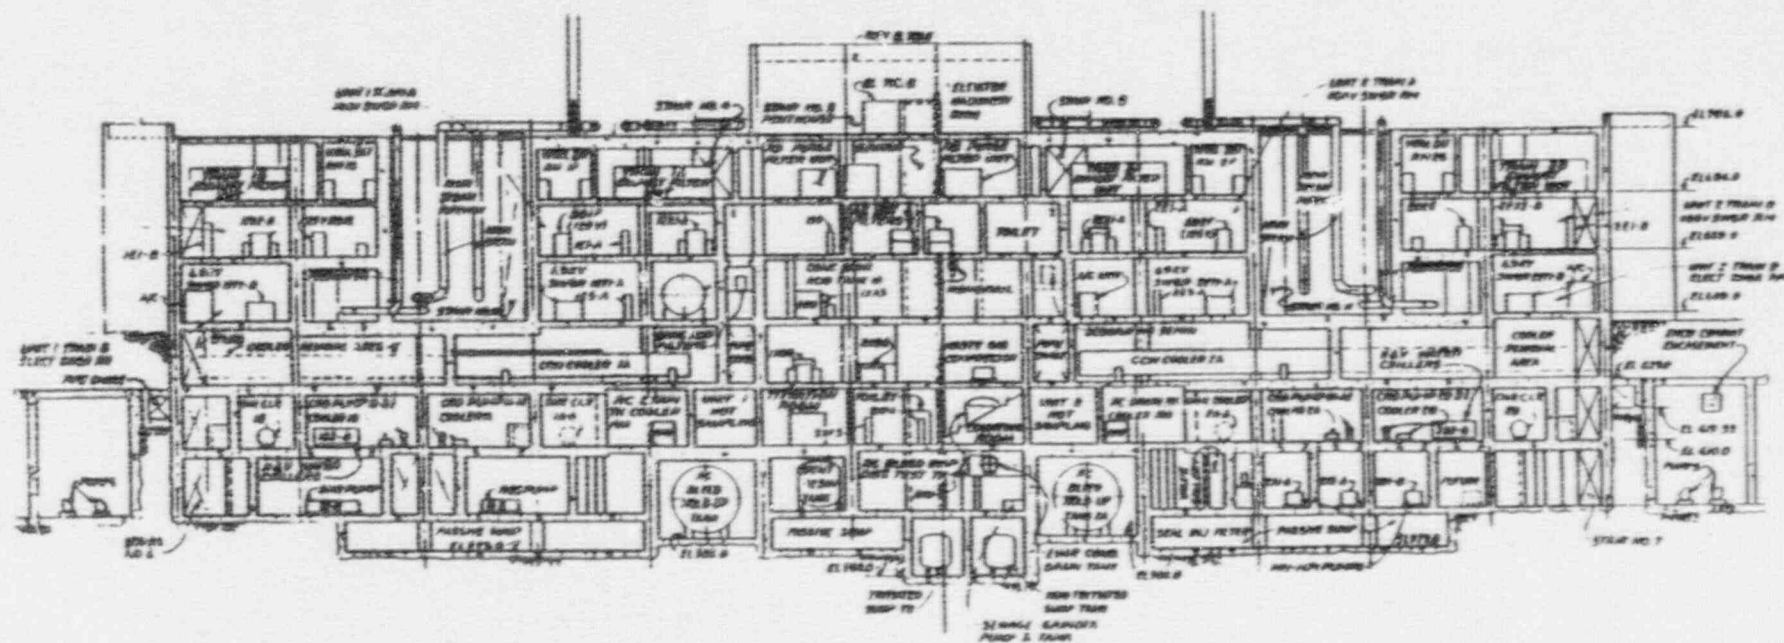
Elevation Views of the Bellefonte Auxiliary and Control Buildings (Sheet 2 of 2)
